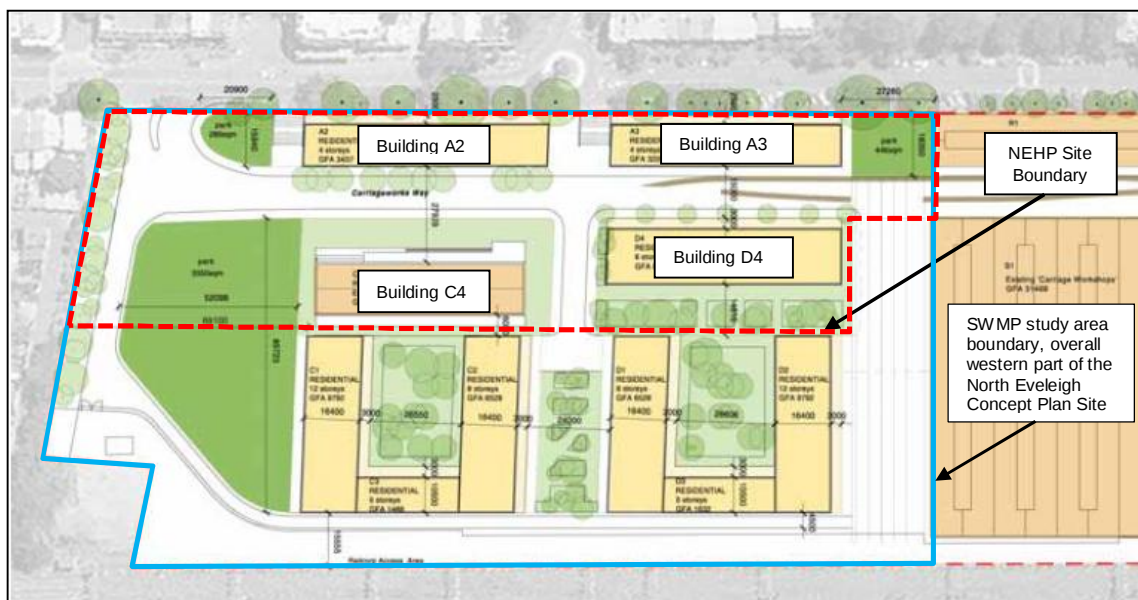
Building plot layout from the North Eveleigh Concept Plan
